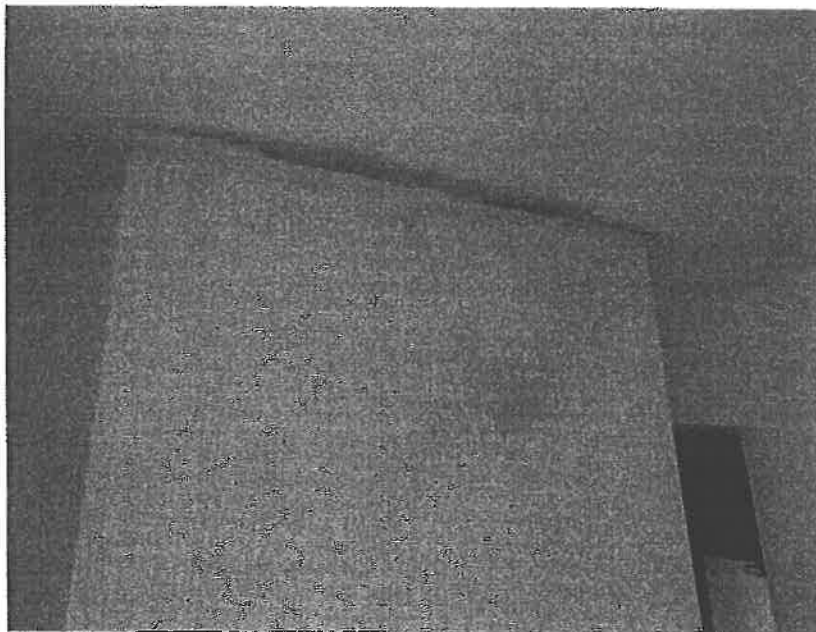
First floor office (south) noting salt deposits to the truss padstone
